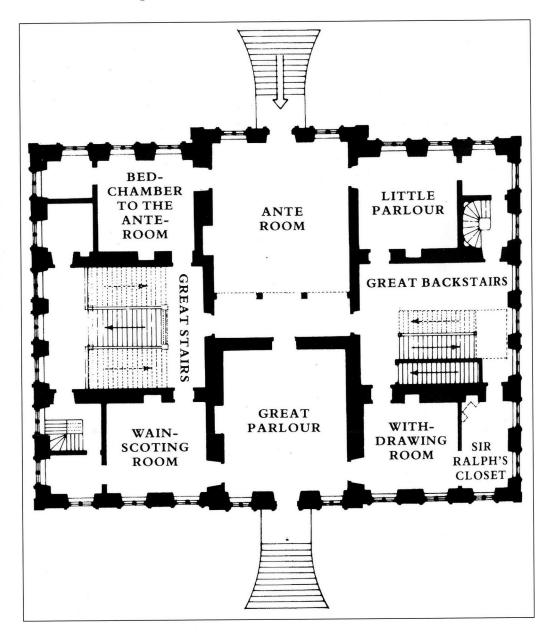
Sir Roger Pratt, Kingston Lacy, Dorset, begun 1663, ground-floor plan By kind permission of the National Trust
